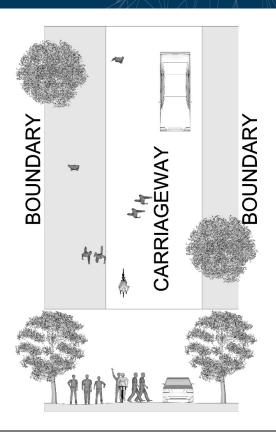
Suburban, live and play, access to houses/townhouses (1 to 20 du)
